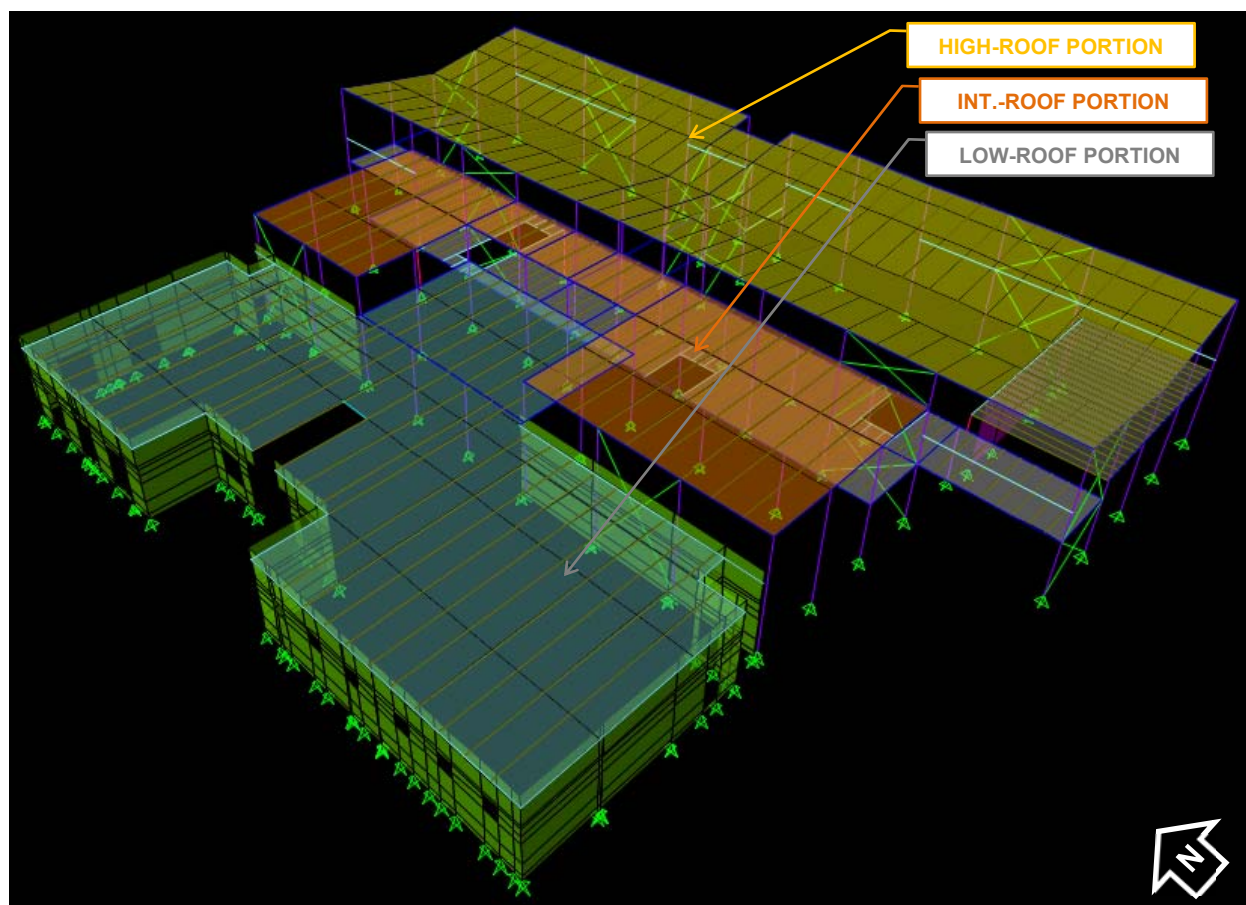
Maintenance Center Analysis Model of Existing Building
